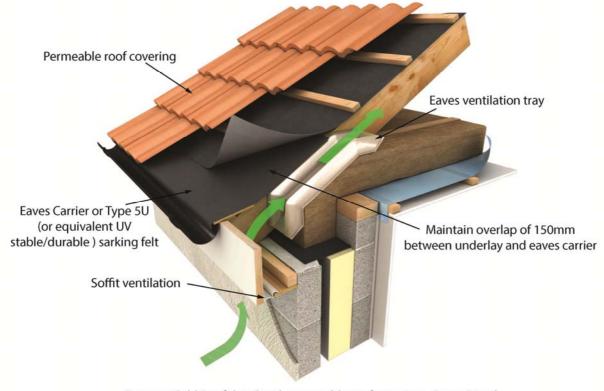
Cold Roof detail with permeable roof covering - Eaves Detail
